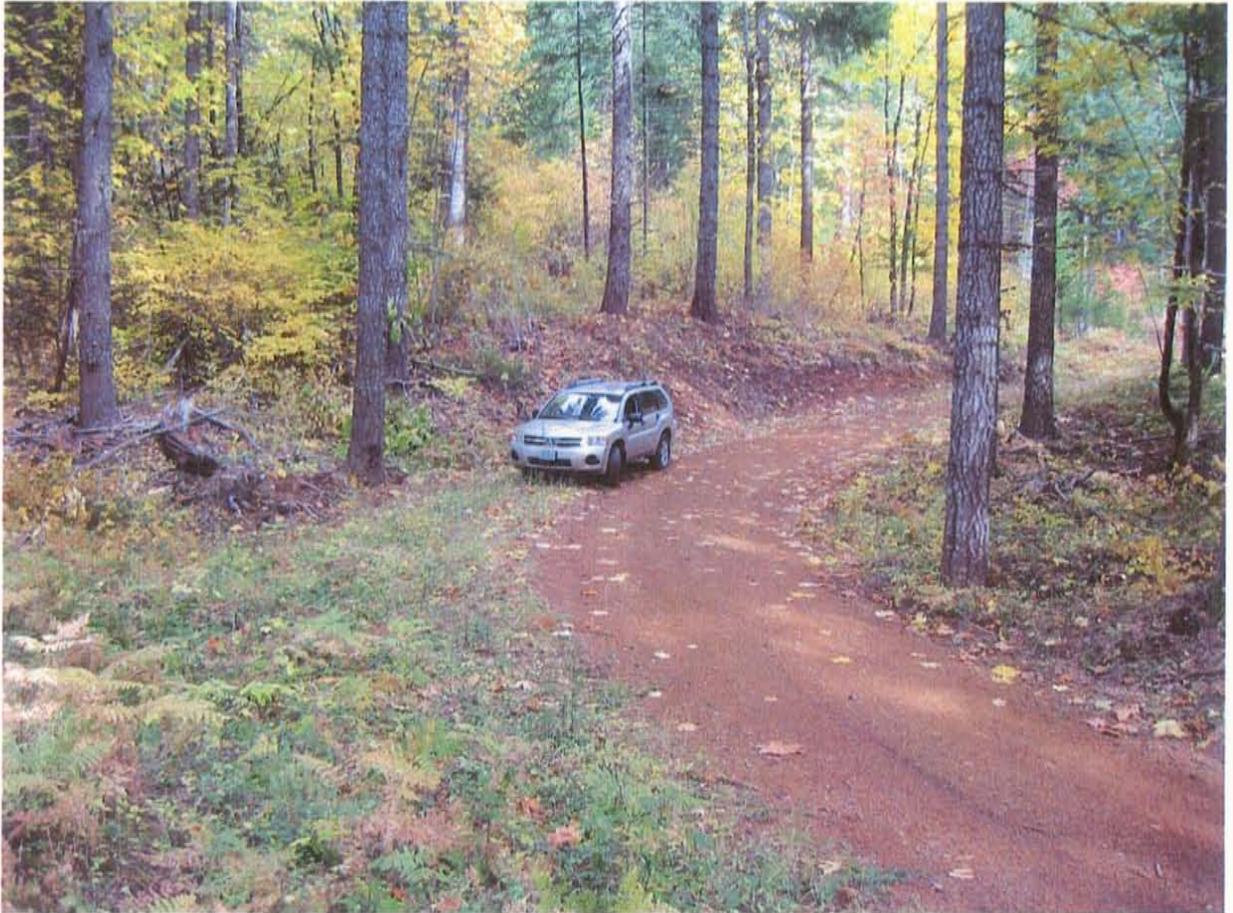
Looking northeast at location of DNR-mapped stream. Drainageway is in front of vehicle. 10/26/06.
